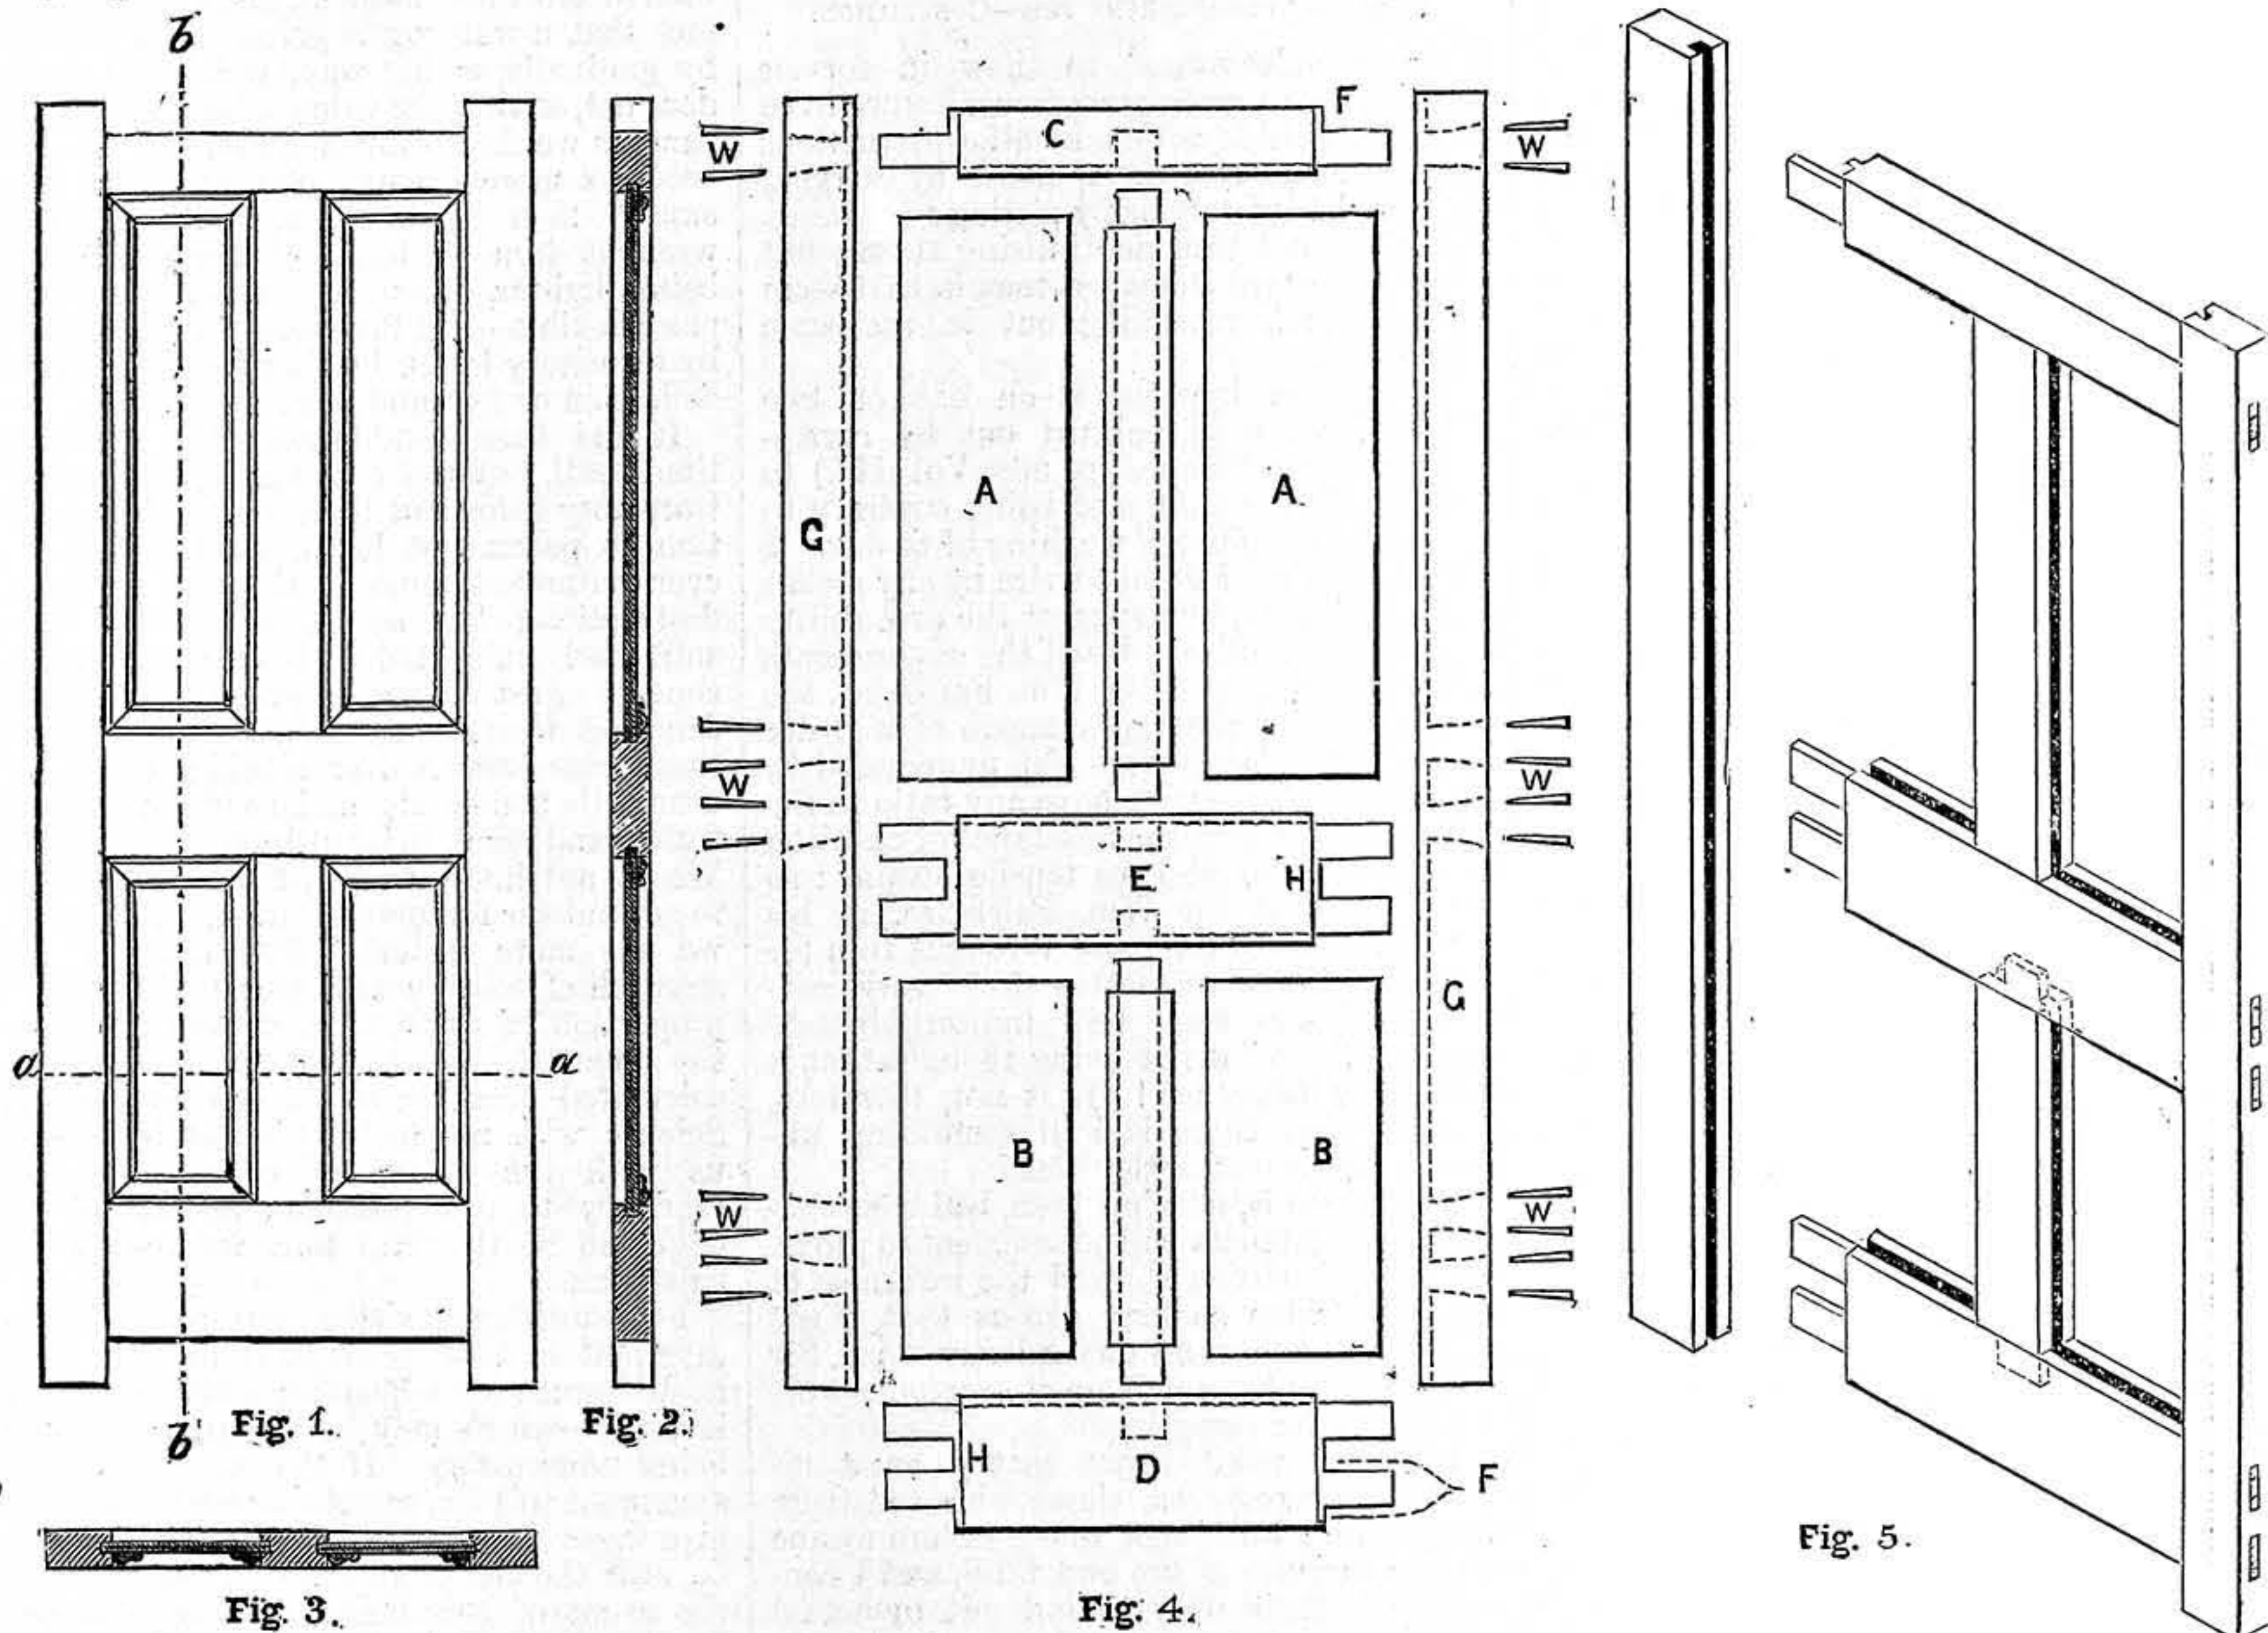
Four-pannelled Door: Front Elevation. Fig. 2.—Ditto: Vertical Section. Fig. 3.—Horizontal Section. Fig. 4.—Various Pieces of Door, except the Mouldings—A, A, Top Panels; B, B, Bottom Panels; C, Top Rail; D, Bottom Rail; E, Middle Rail; G, G, Stiles; H, Shoulder; W, Wedge. Fig. 5.—Door partly put together, with Panels omitted.
